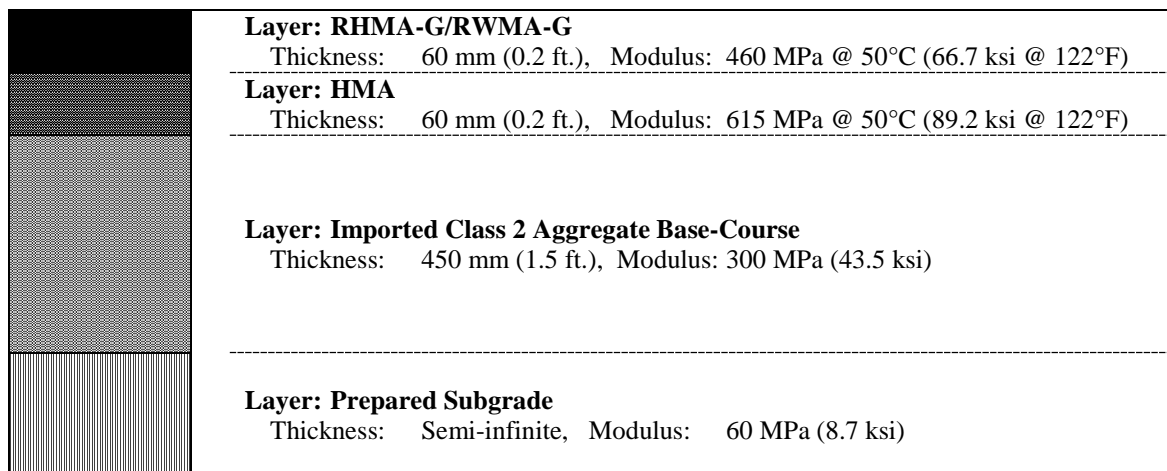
Pavement structure for rubberized warm-mix asphalt test sections.
